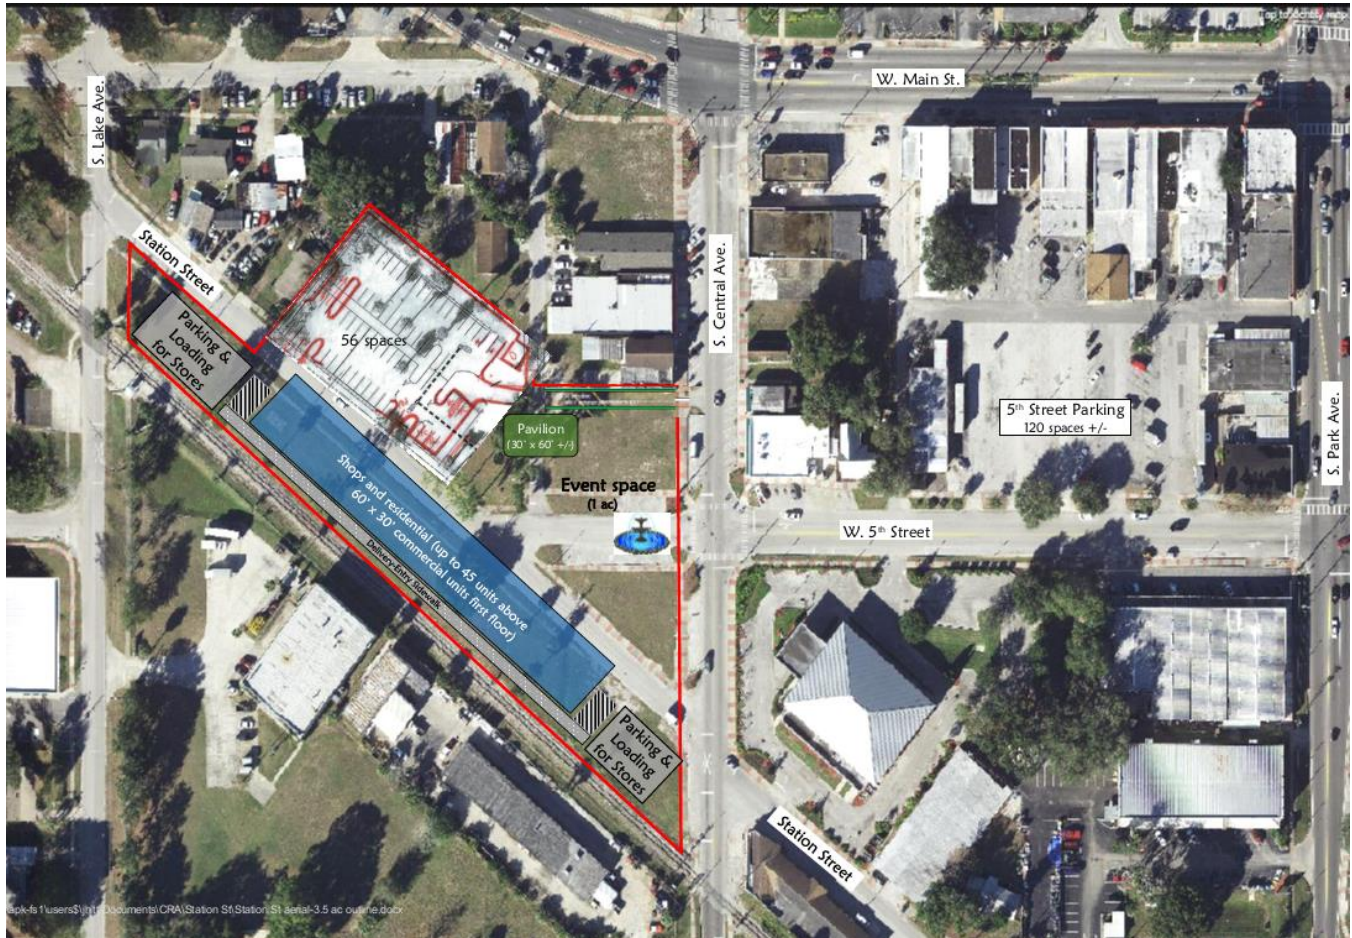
Main Street, 5th Street, and Central Avenue Redevelopment Concept Alternative
